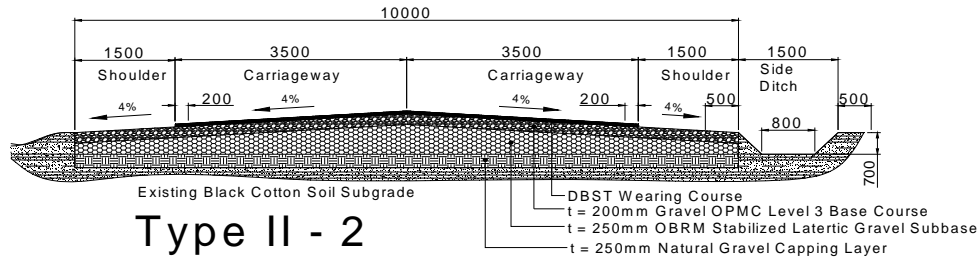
Typical Cross section of Type II-2 of the Juba River Port Access Road depicting the experimental trial section pavement structure with OPMC Level 3 stabilization and OBRM stabilization for Base/Subbase as well as partial Black Cotton Soil subgrade improvement
